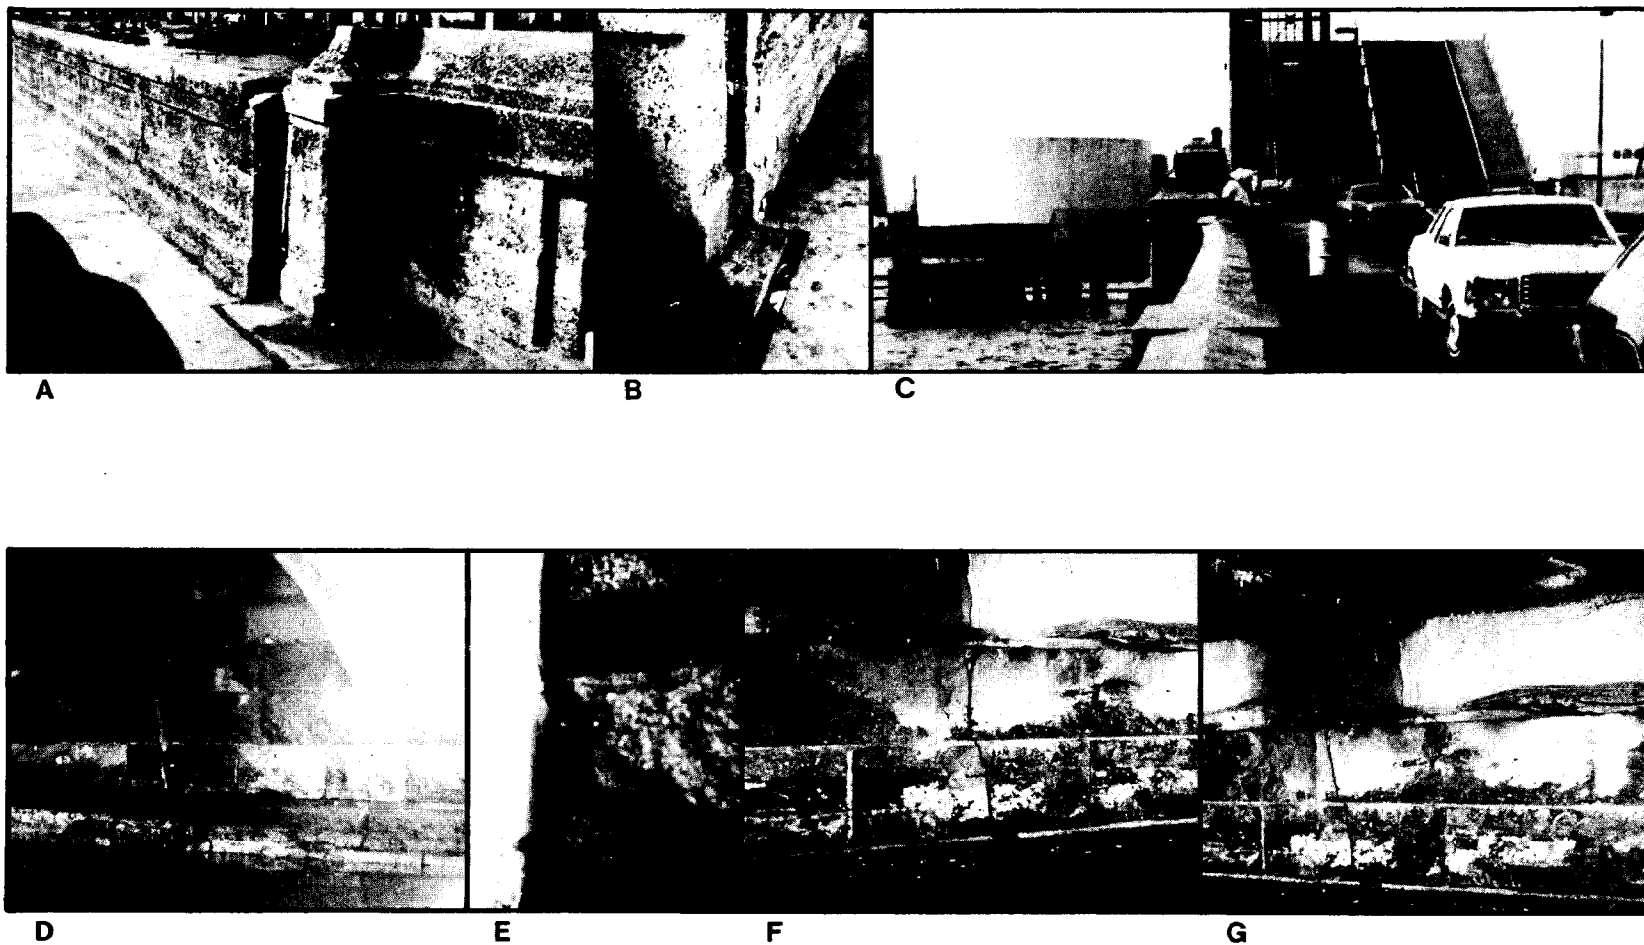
Substructure Problems. Major signs of distress include rotation of the northeast wingwall at the east abutment (A); displacement of the southeast wingwall (east abutment) (B and C); shear in west abutment (D); rotation of northwest wingwall (E); and shear cracks through both faces of pier 2 on the east approach (F and G).
